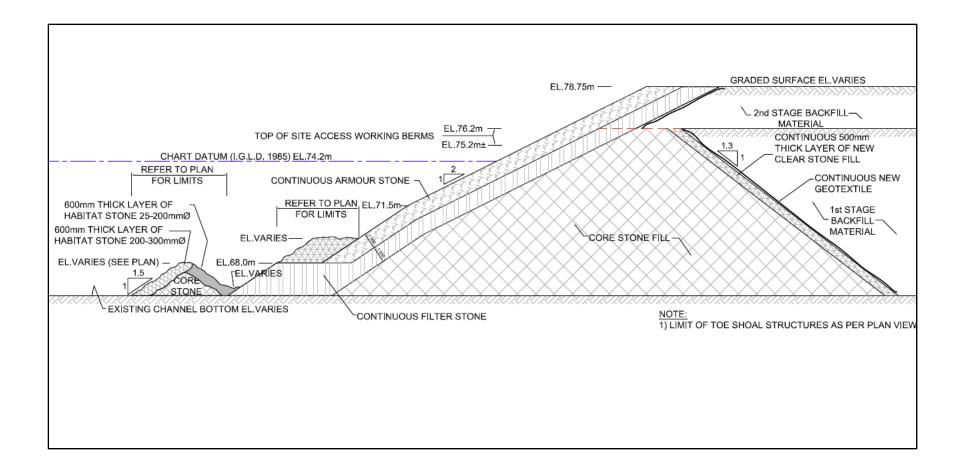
Typical Toe Shoal Section on Confinement Berm
